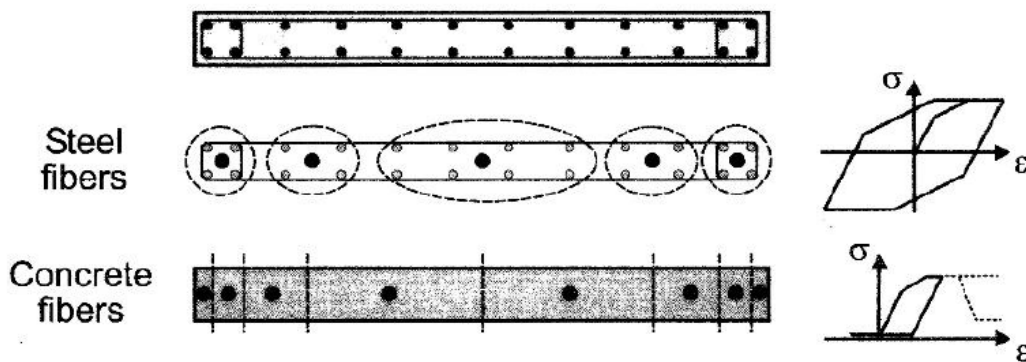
Fiber section for in-plane bending behavior of a reinforced concrete wall
